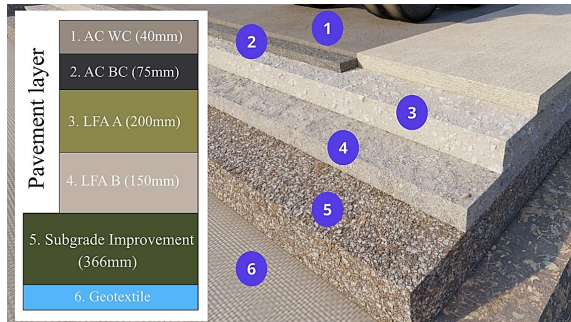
Subgrade design with cyclic loading and geotextile-reinforced subgrade.
